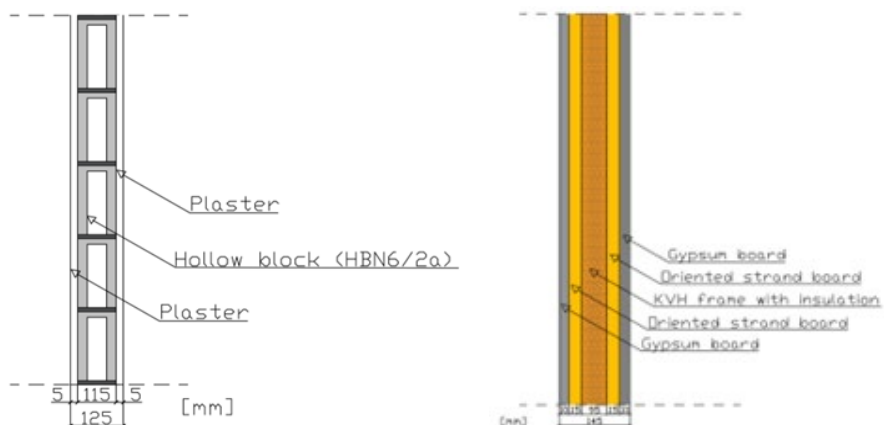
Section view of the internal wall of the concrete (left) and timber (right) building.
